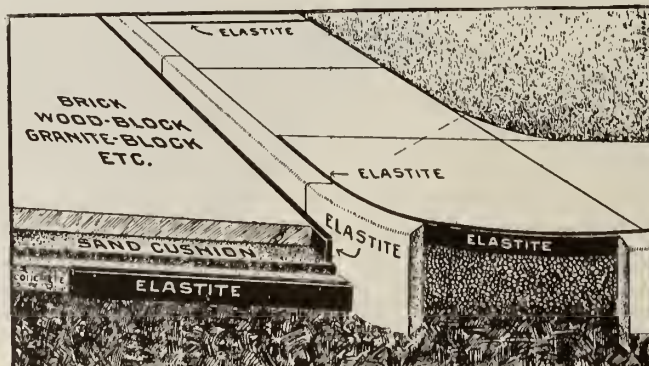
CAREY ELASTITE EXPANSION JOINT SHOWING INSTALLATION
